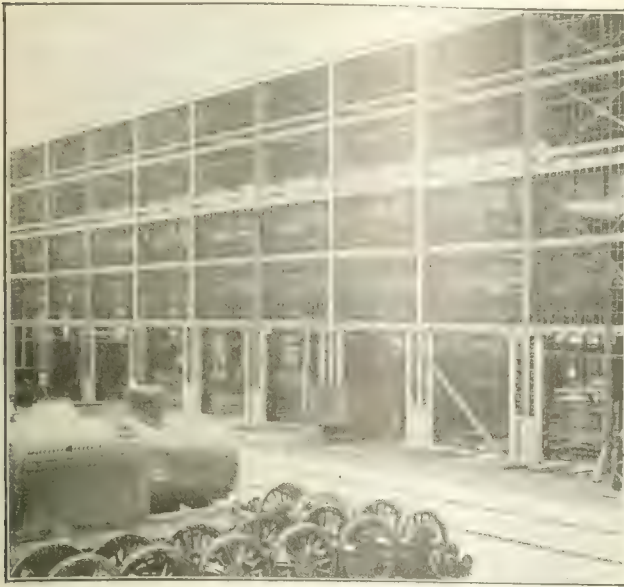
STEEL SASH OUTSIDE OF STRUCTURAL FRAME
